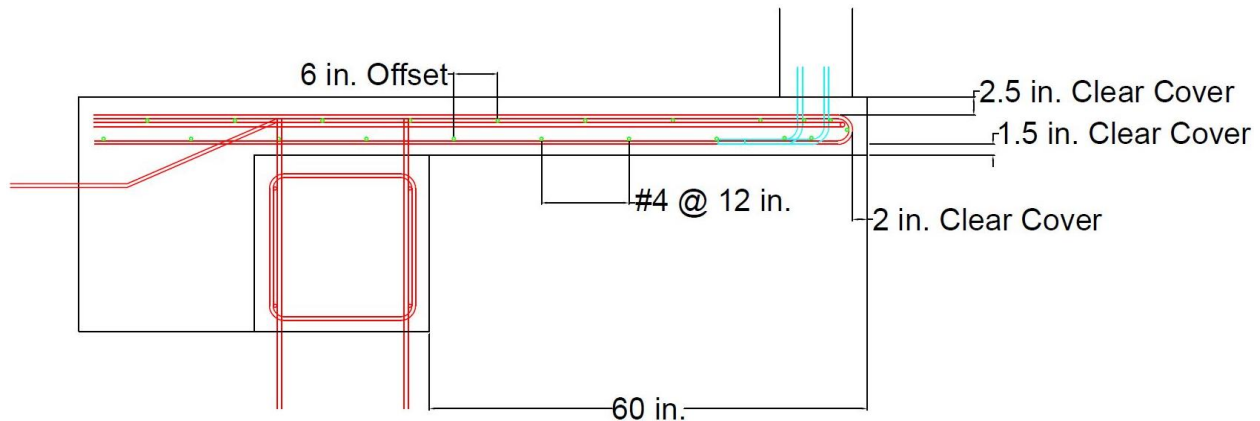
Option 1, Bridge Deck Overhang Cross Section
